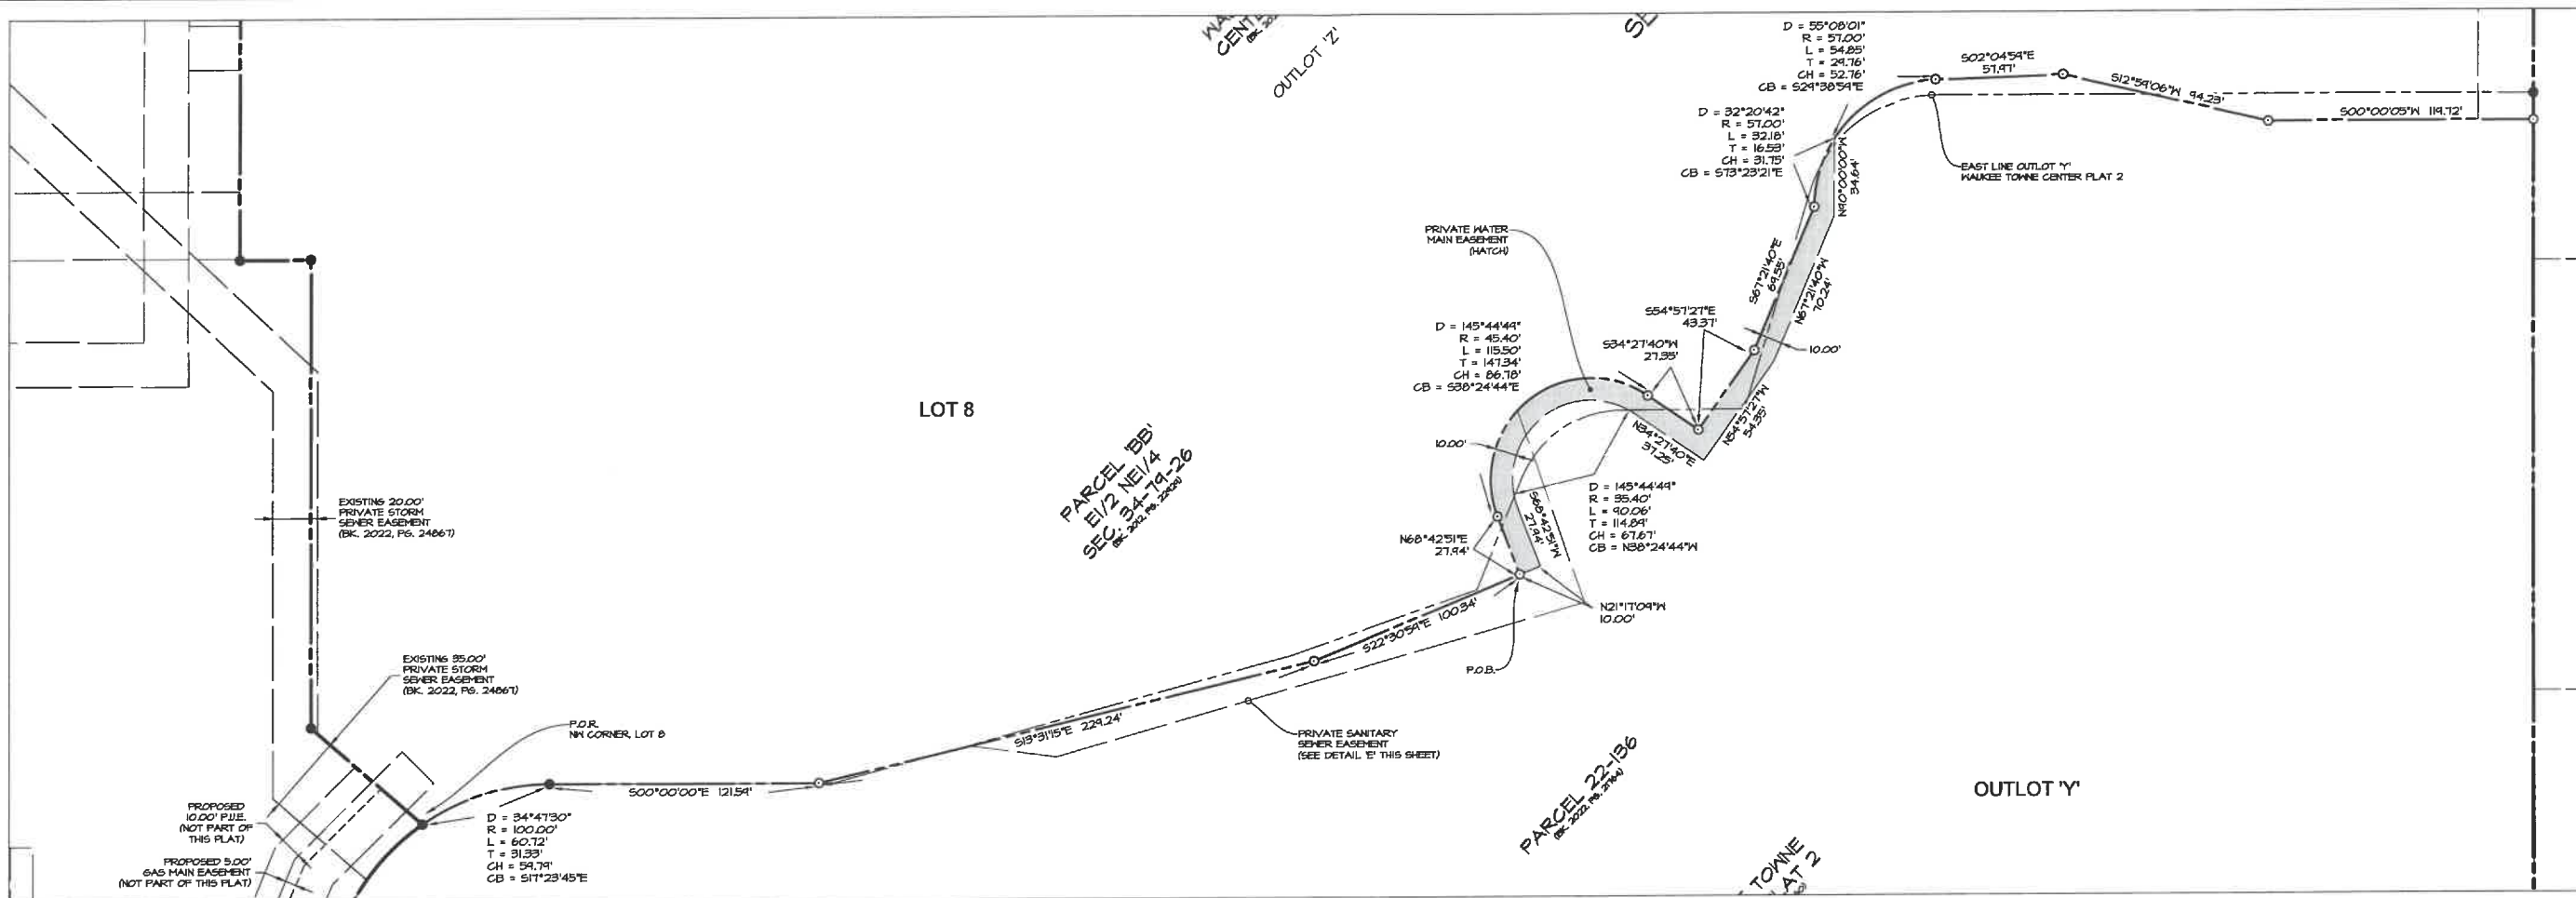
DETAIL 'C' - PRIVATE SANITARY SEWER EASEMENT
